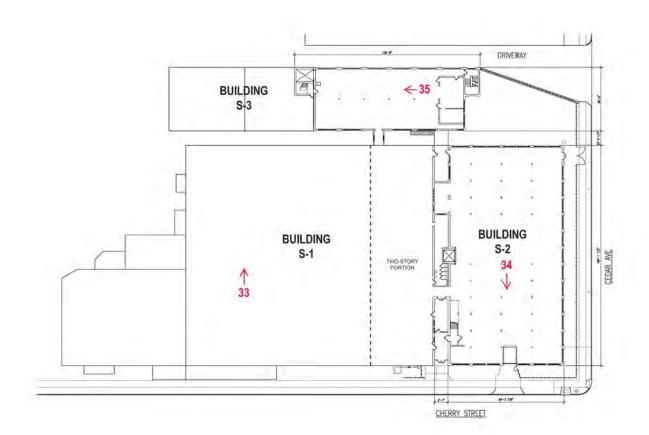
B: Existing Plans (Building S-1, S-2 and S-3) with Interior Photo Key.
